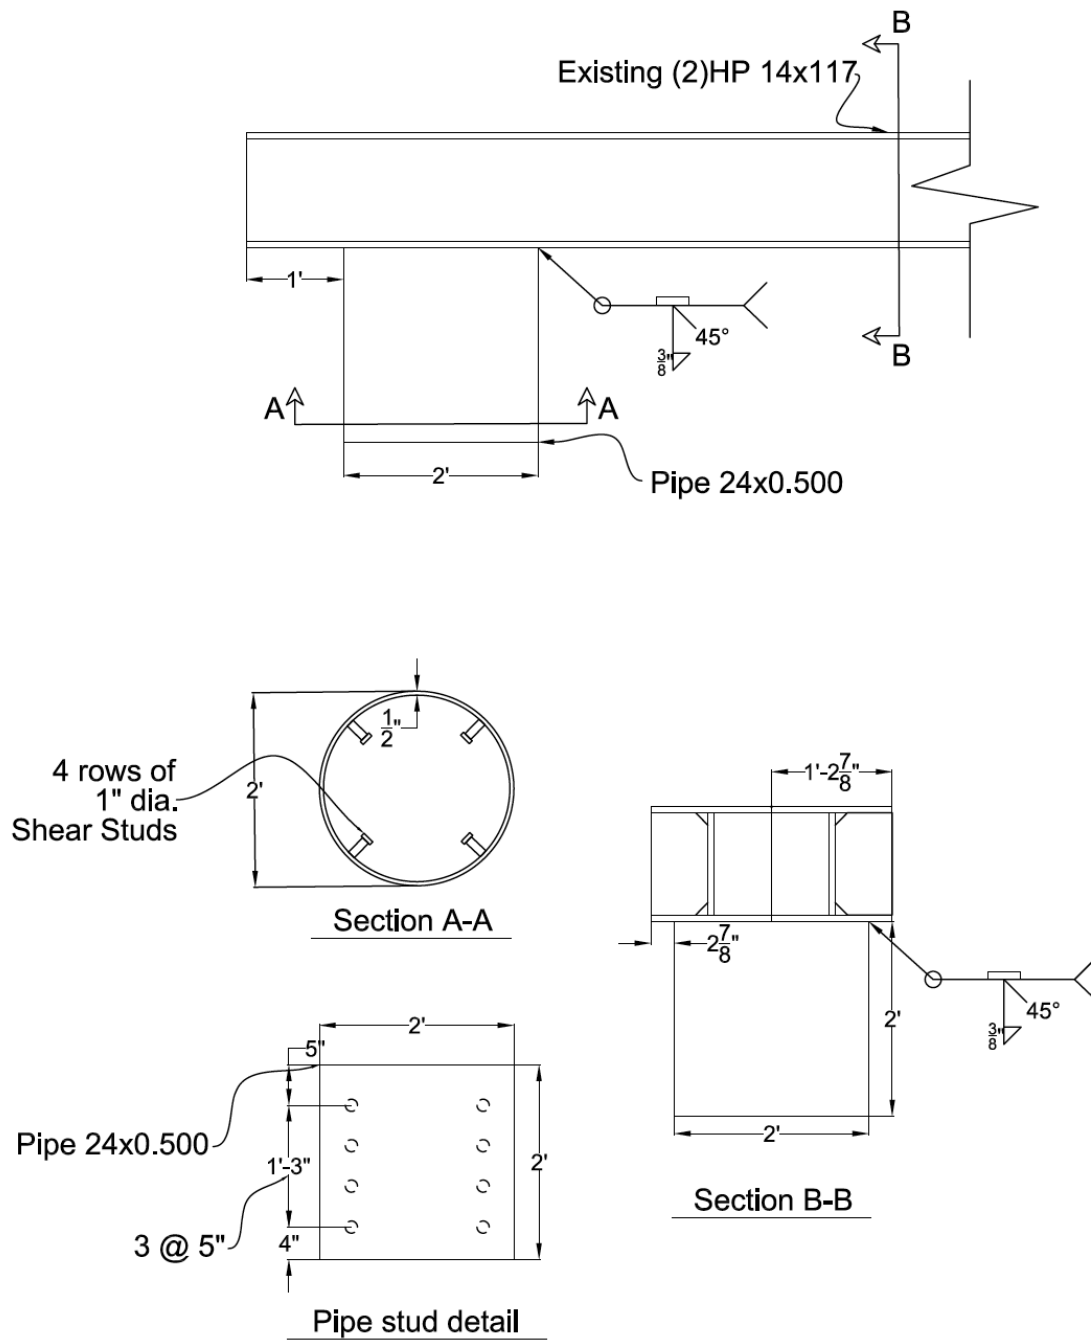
Fabrication details for the cap-beam stub assembly of Tests 1 through 4.
